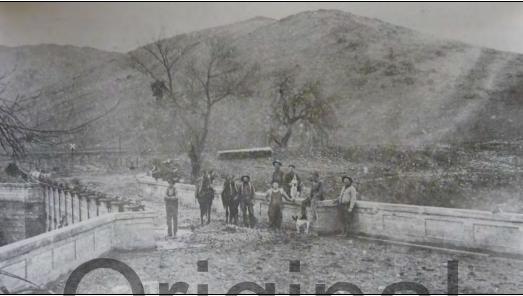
New AID Main Canal headgate and bridge on North Frankwood Avenue, as constructed in 1914, camera facing southwest. <sup>43</sup>
